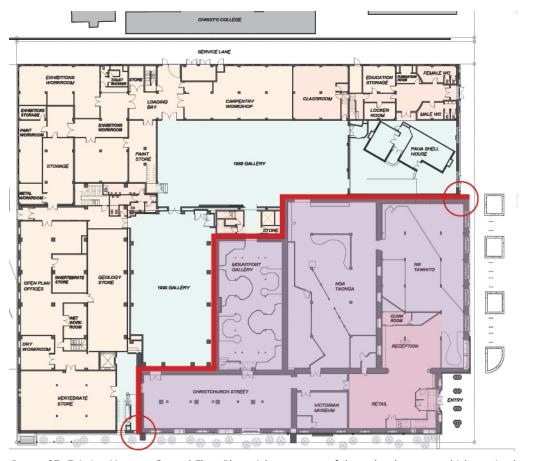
Existing Museum Ground Floor Plan. A key concept of the redevelopment, which received wide support during the consultation process, was the full unveiling of the Mountfort building era (area in purple) so that it can be readily understood in full. This involved the unveiling of the currently internal Mountfort facades (red line) and it is highly desirable than this understanding of the most significant of the Museum buildings can be complete with the removal of a small portion of heritage fabric of secondary significance (areas circled).
